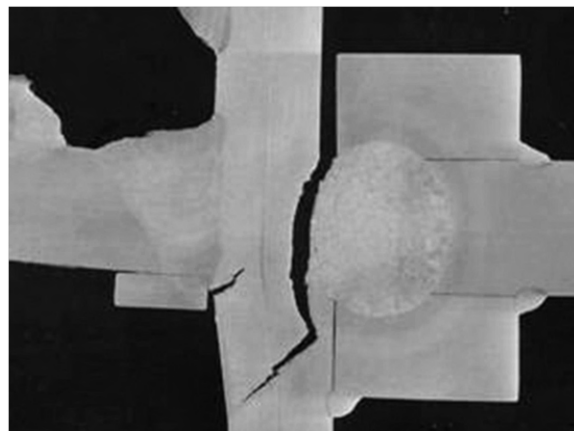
Example of ESW joint fracture in beam-to-box column subassembly loading tests (JSSC, 2016a).
